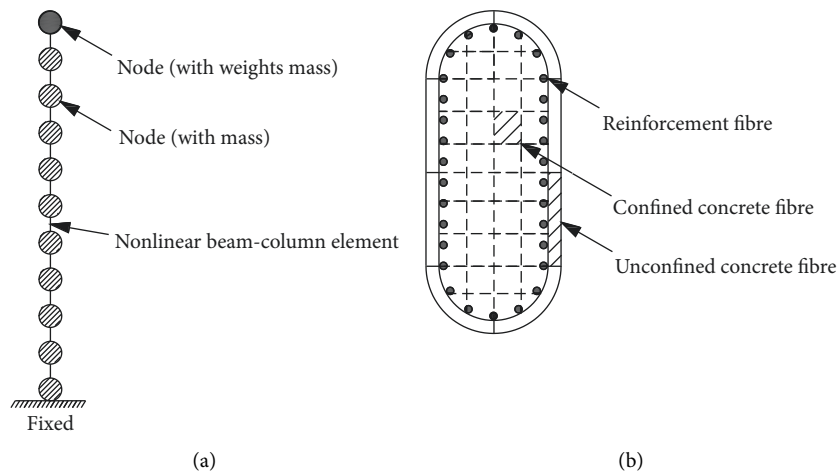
(a) Element model. (b) Fibre section of the experimental pier specimen.
